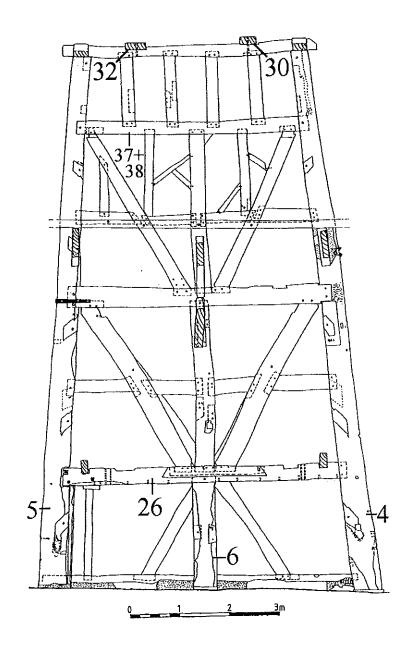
West elevation of the tower showing location of samples 4-6 inclusive, 26, 30, 32, 37 and 38, after Morriss *et al* (1998)
